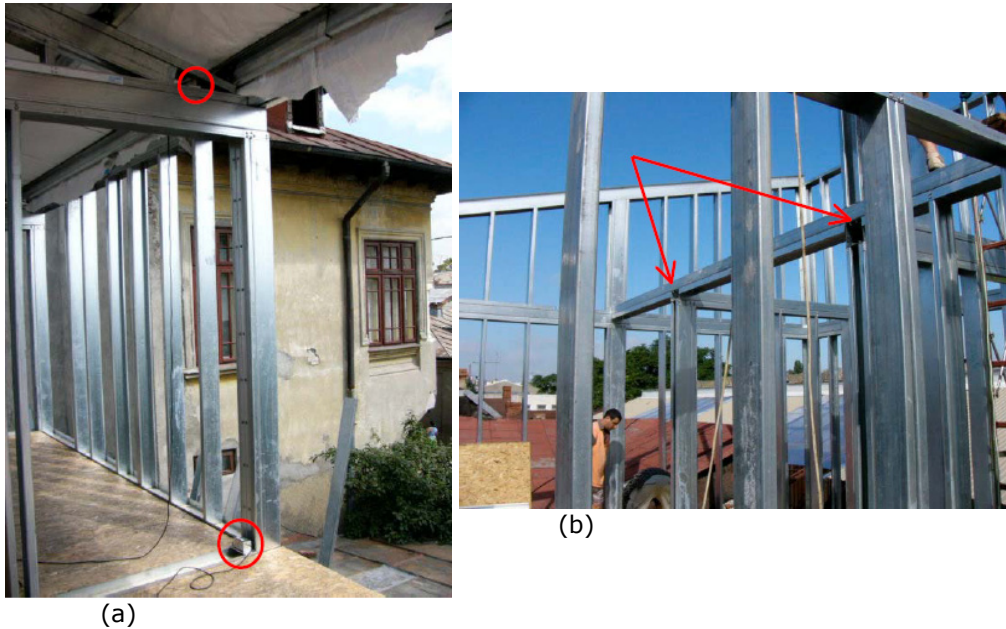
Construction Stage 1 and sensor location on the skeleton of the structure.
